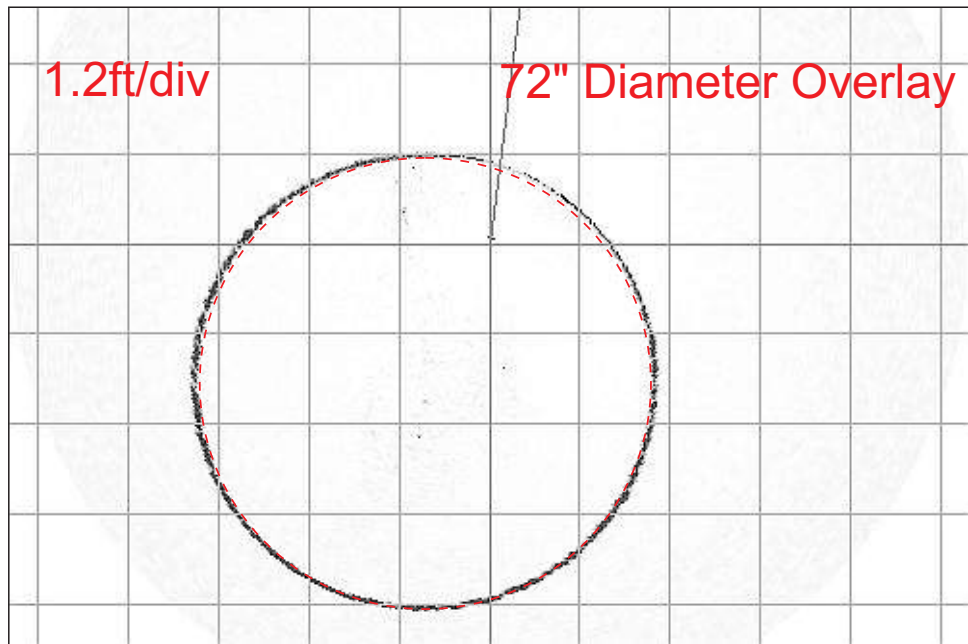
Sonar Profile 1 - 237 feet downstream of Access Point 1.
